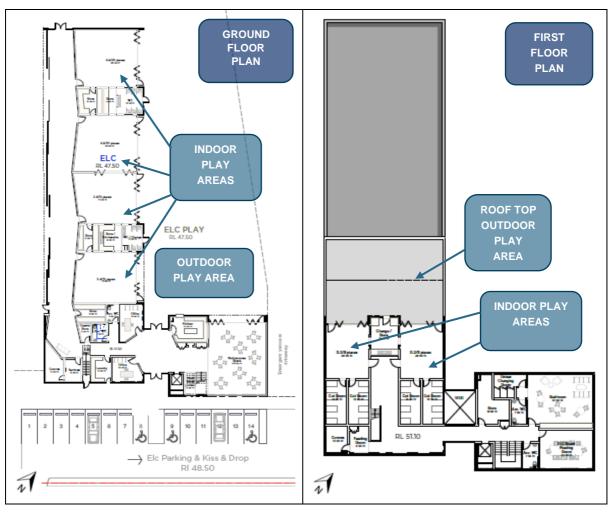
| ELC floor plans (Source: Applicant's RtS 2020)
